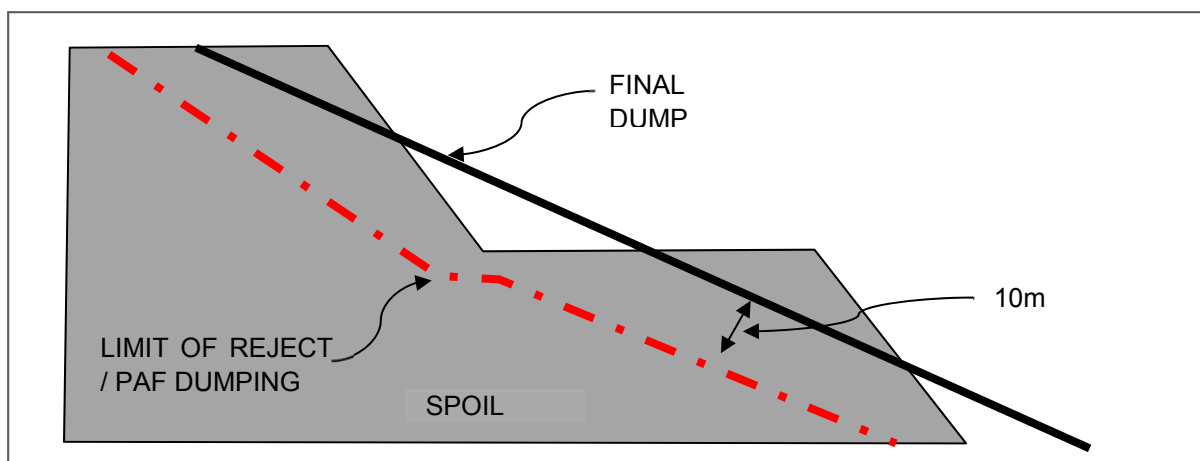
Typical Cross-section of spoil dump and 10m minimum cover.
